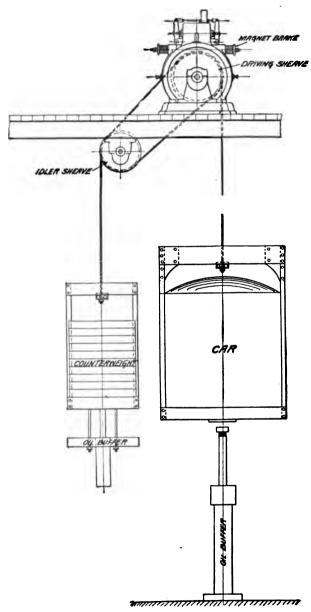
Diagram Showing General Arrangement of Roping for Traction Elevator Courtesy of Otis Elevator Company
